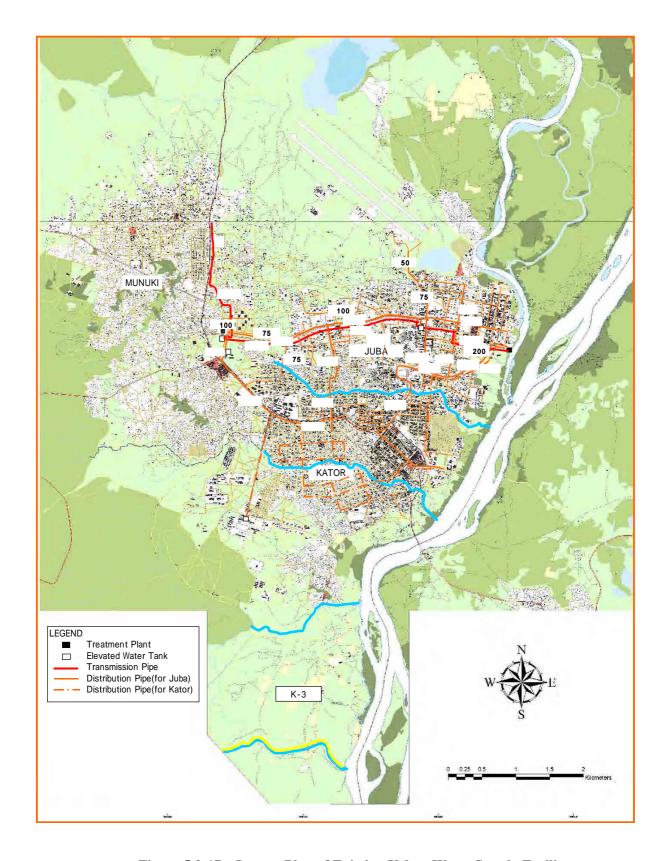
Layout Plan of Existing Urban Water Supply Facility
